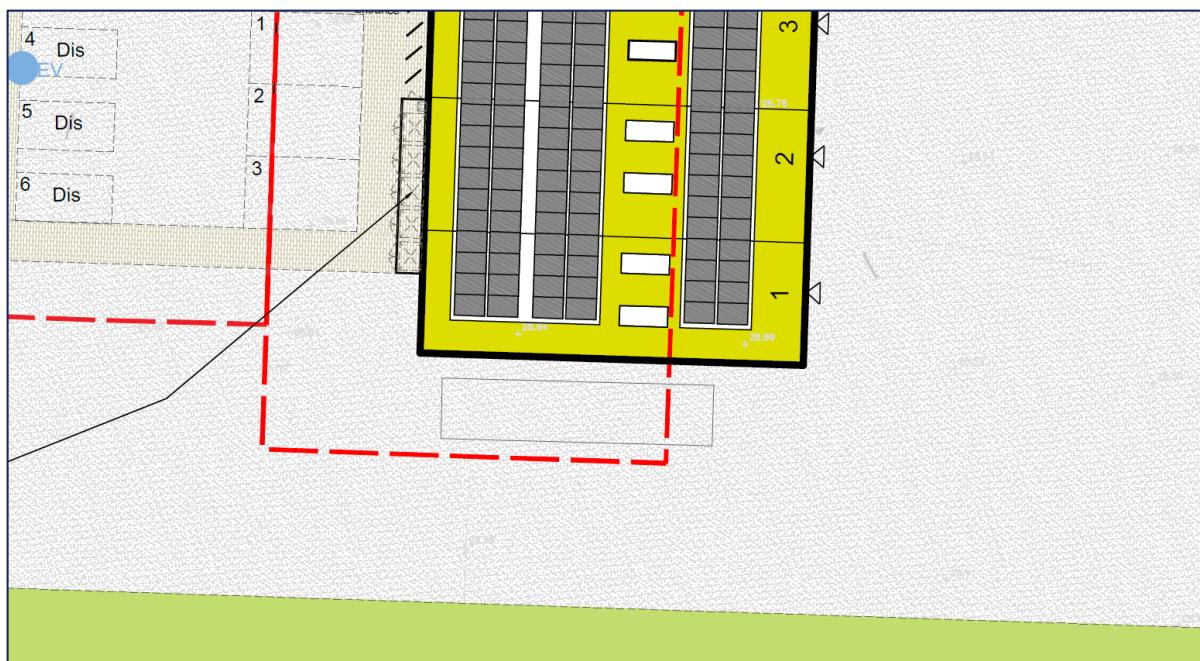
An extract of the Proposed Site Plan with the proposed bin store adjoining the western elevation of the service building with the grey box to the south of the building indicating where the refuse vehicles will stop.
